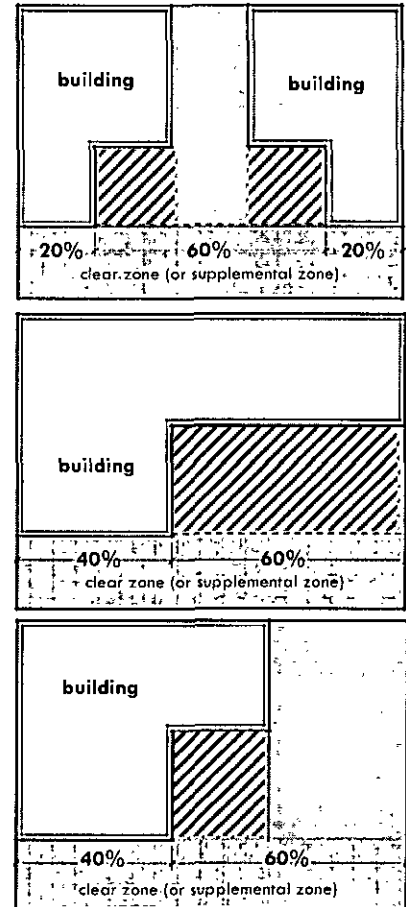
Examples of building placement on urban roadways. Parking is generally not permitted in the hatched area between the building facade and the sidewalk, except for shallow lots, as described in paragraph D.
